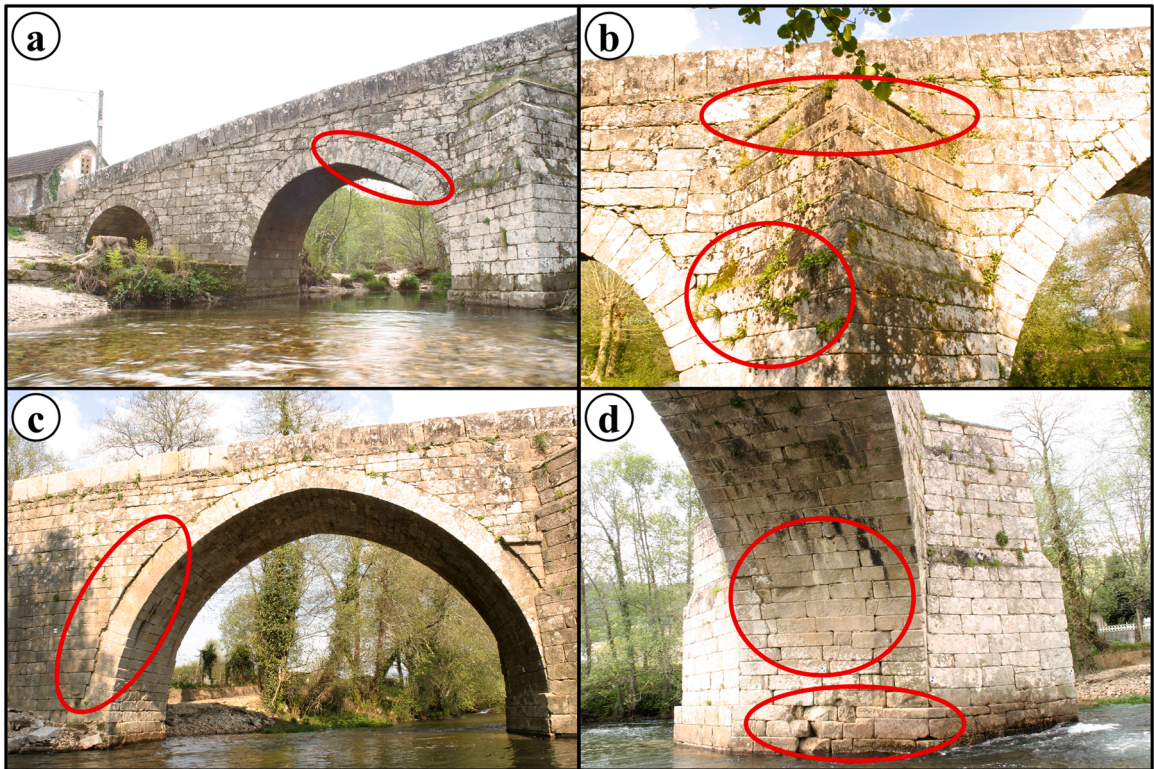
Details of the current condition of Cernadela Bridge: (a) Deformation in arch D (b) Vegetation (c) Out-of-plane spandrel wall deformations (d) Cracks and detachment of elements.
